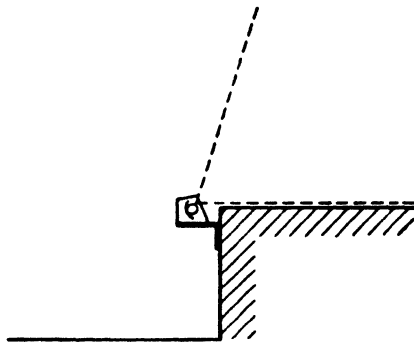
SECTION: FOOTLIGHT BRACKETS TO SAVE STAGE SPACE
